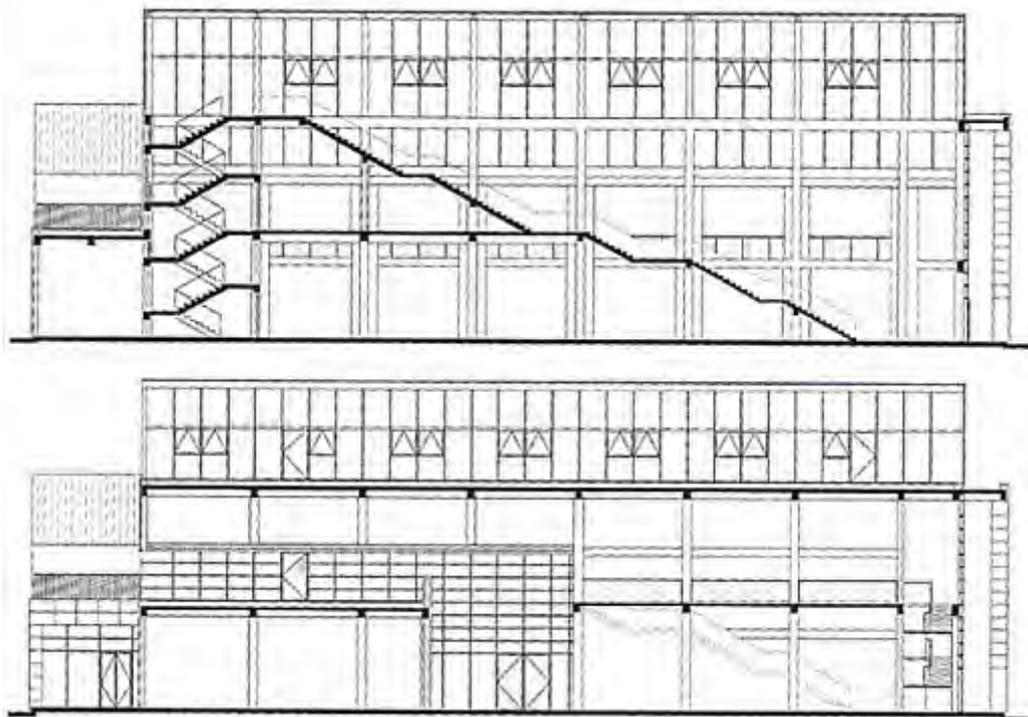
The sections of 4# building (Source: Chongxin ZHAO, “Reconstructing of 1933 Old Mill,” Architectural Creation, 2008, 50–56)
